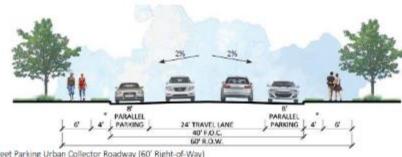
On-Street Parking Urban Collector Roadway (60' Right-of-Way) NOTE: Cross slope or crowned roadways may be utilized.
